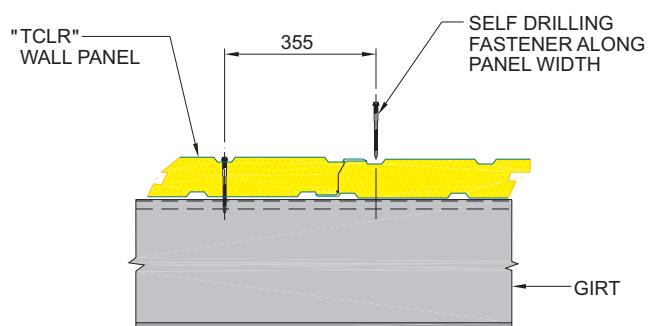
DETAIL-A : "TCLR" WALL PANEL AT CORNER EAVE
